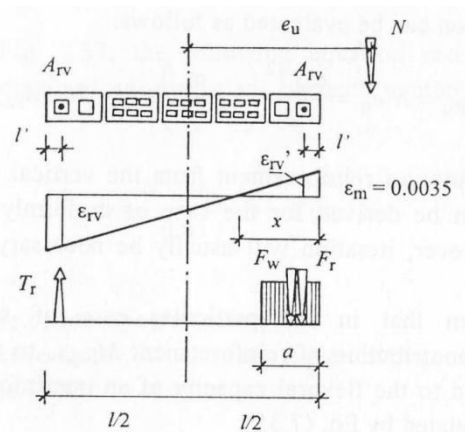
Equilibrium of sectional forces at flexural failure of a reinforced masonry wall (from Tomažević, 1999).
